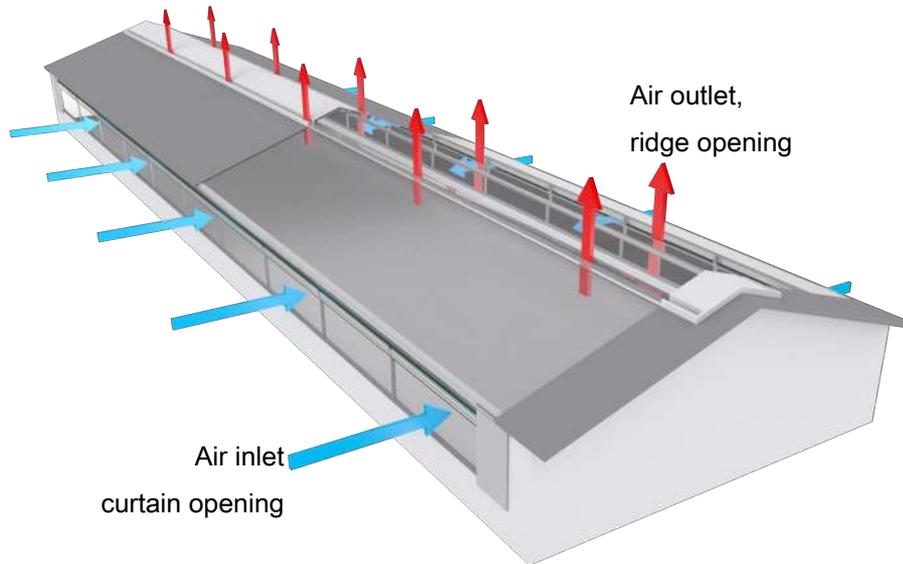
For example, on a house with pure natural ventilation with curtain openings on the sides of the house and ridge opening in the roof.
